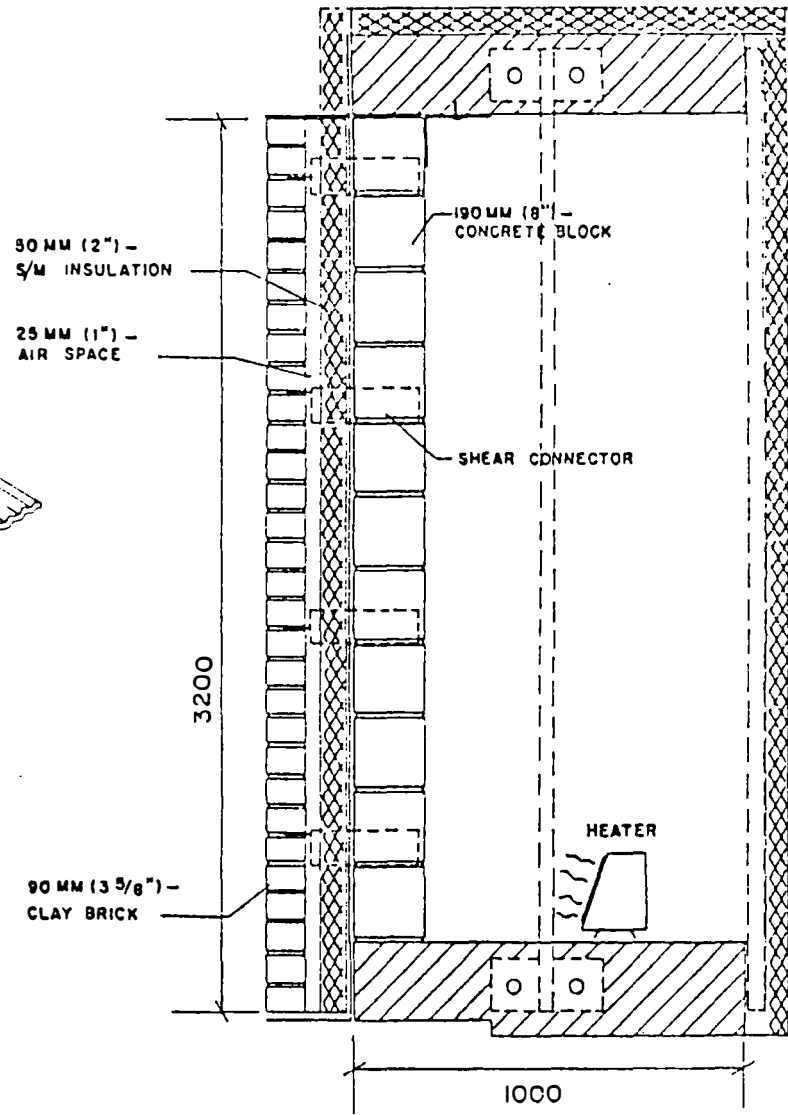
Cross- Section of Test Climber and Wall Section,
